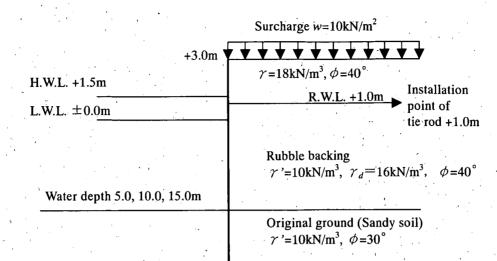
Overview of Pile-Sheet Quaywall and Study Conditions
